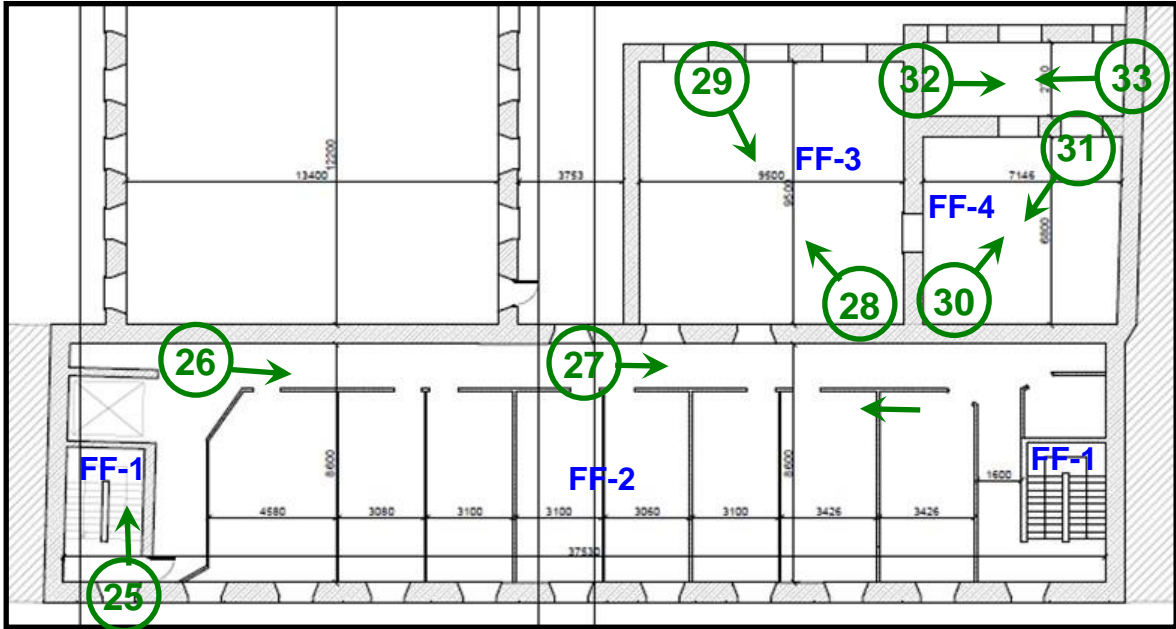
First-floor plan of front building, with room numbers and photograph locations
